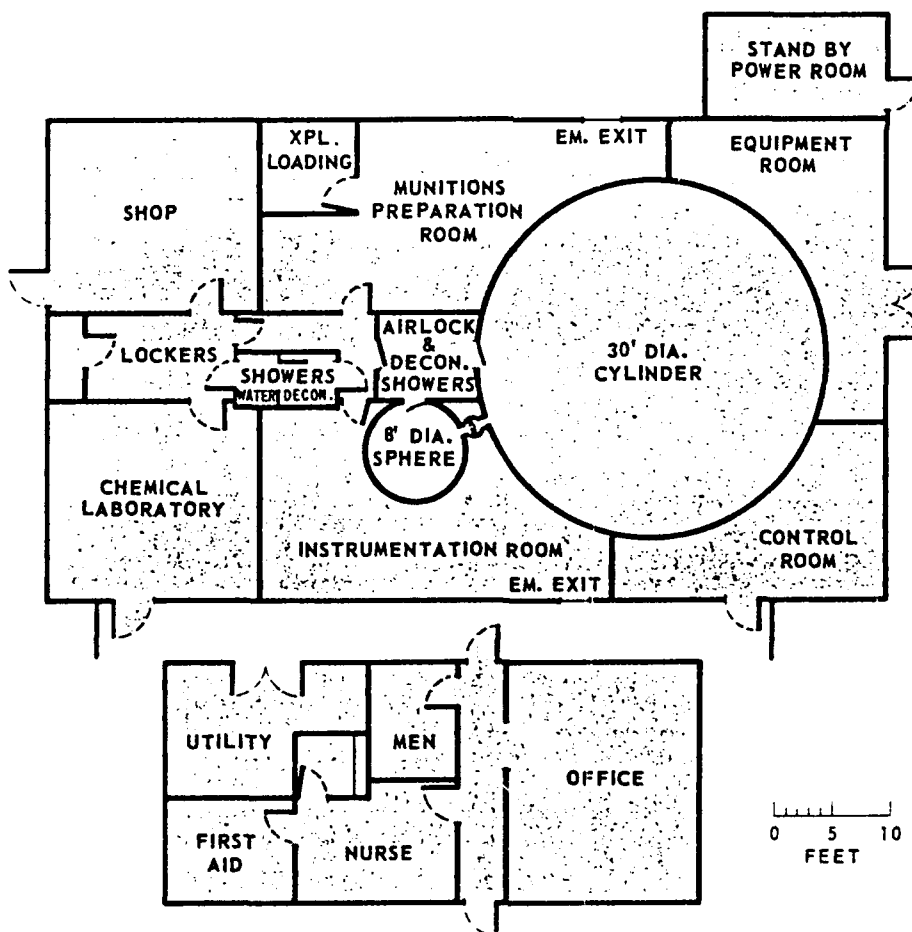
FLOOR PLAN OF CHAMBER FACILITY
